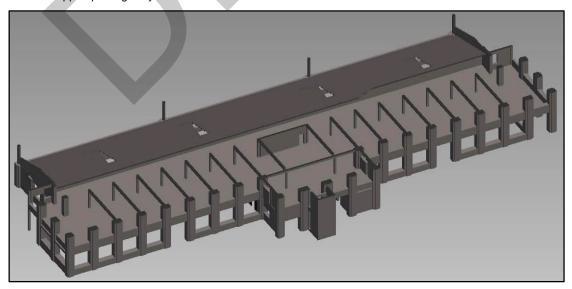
Cutaway showing beams, walls, and columns at the first floor level at GNS
